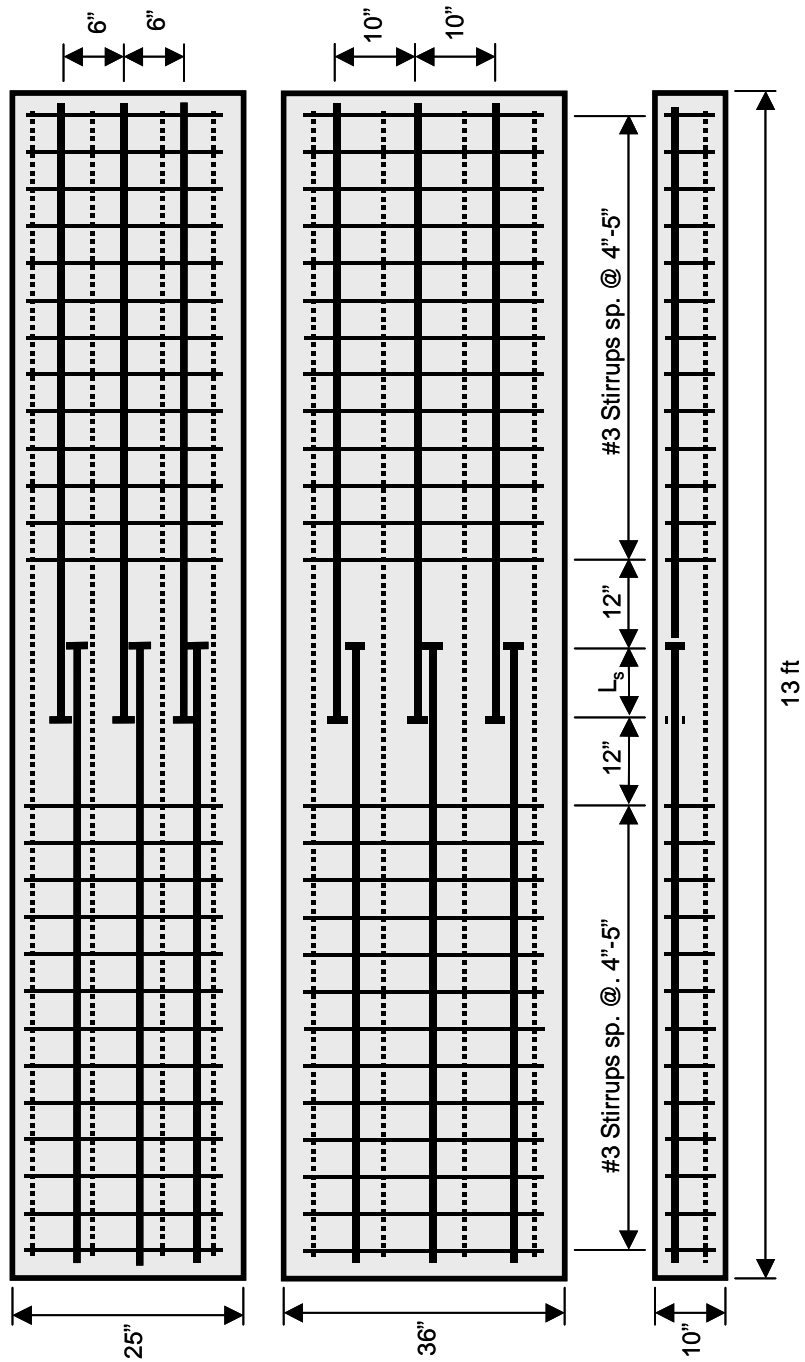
(b) – Reinforcement Layout for Adjacent Specimens w/ #8 Bars
